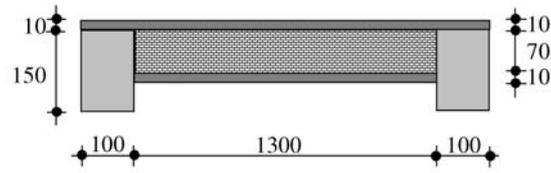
Brick Infill and Plastering Detail for Specimens U2 and U3
